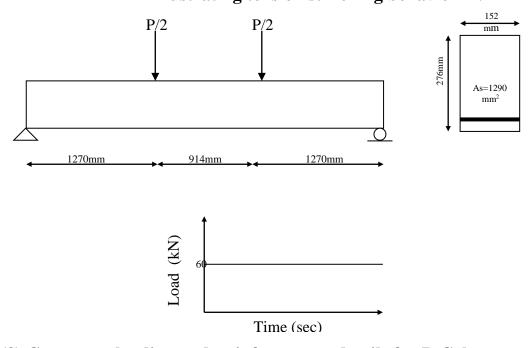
Geometry, loading and reinforcement details for R.C. beam under step load.
